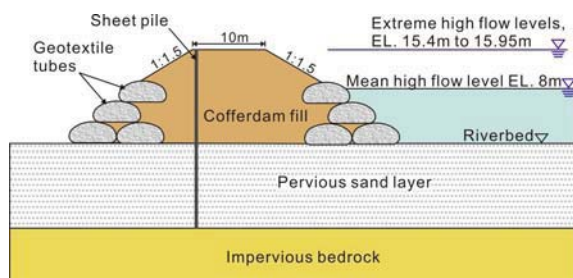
Cofferdam for construction of northeast portion of proposed Dalsung Weir
